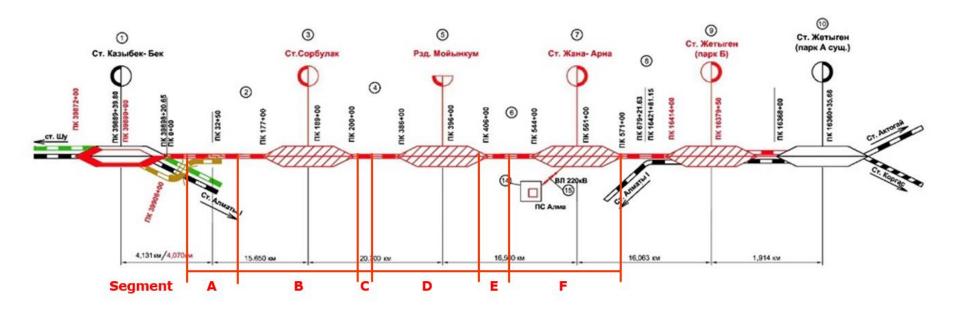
CONSTRUCTION SECTION LAYOUT
